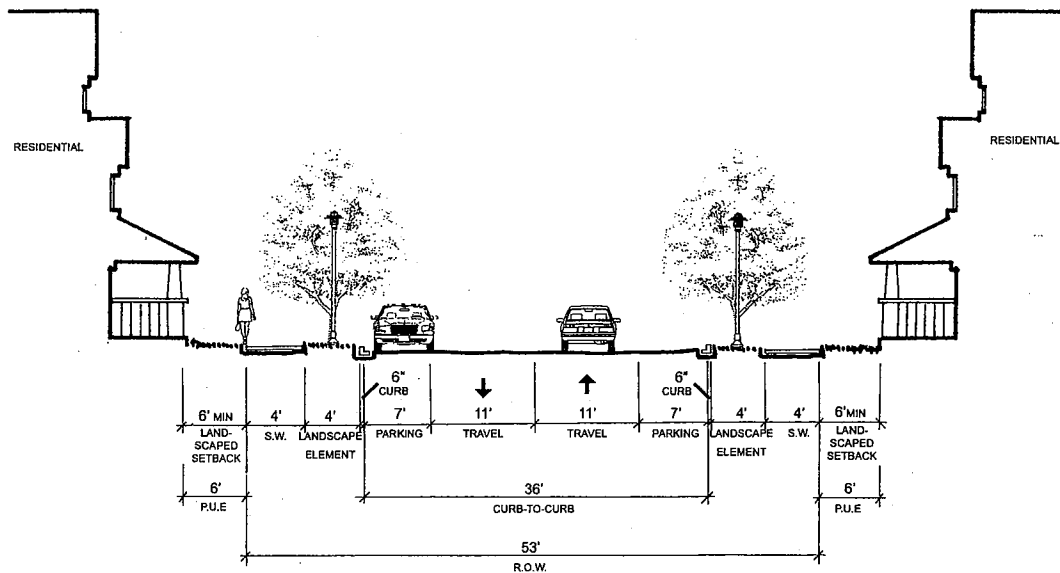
D.27: Mariner's Cove Residential Street Cross Section (Typical) ①
